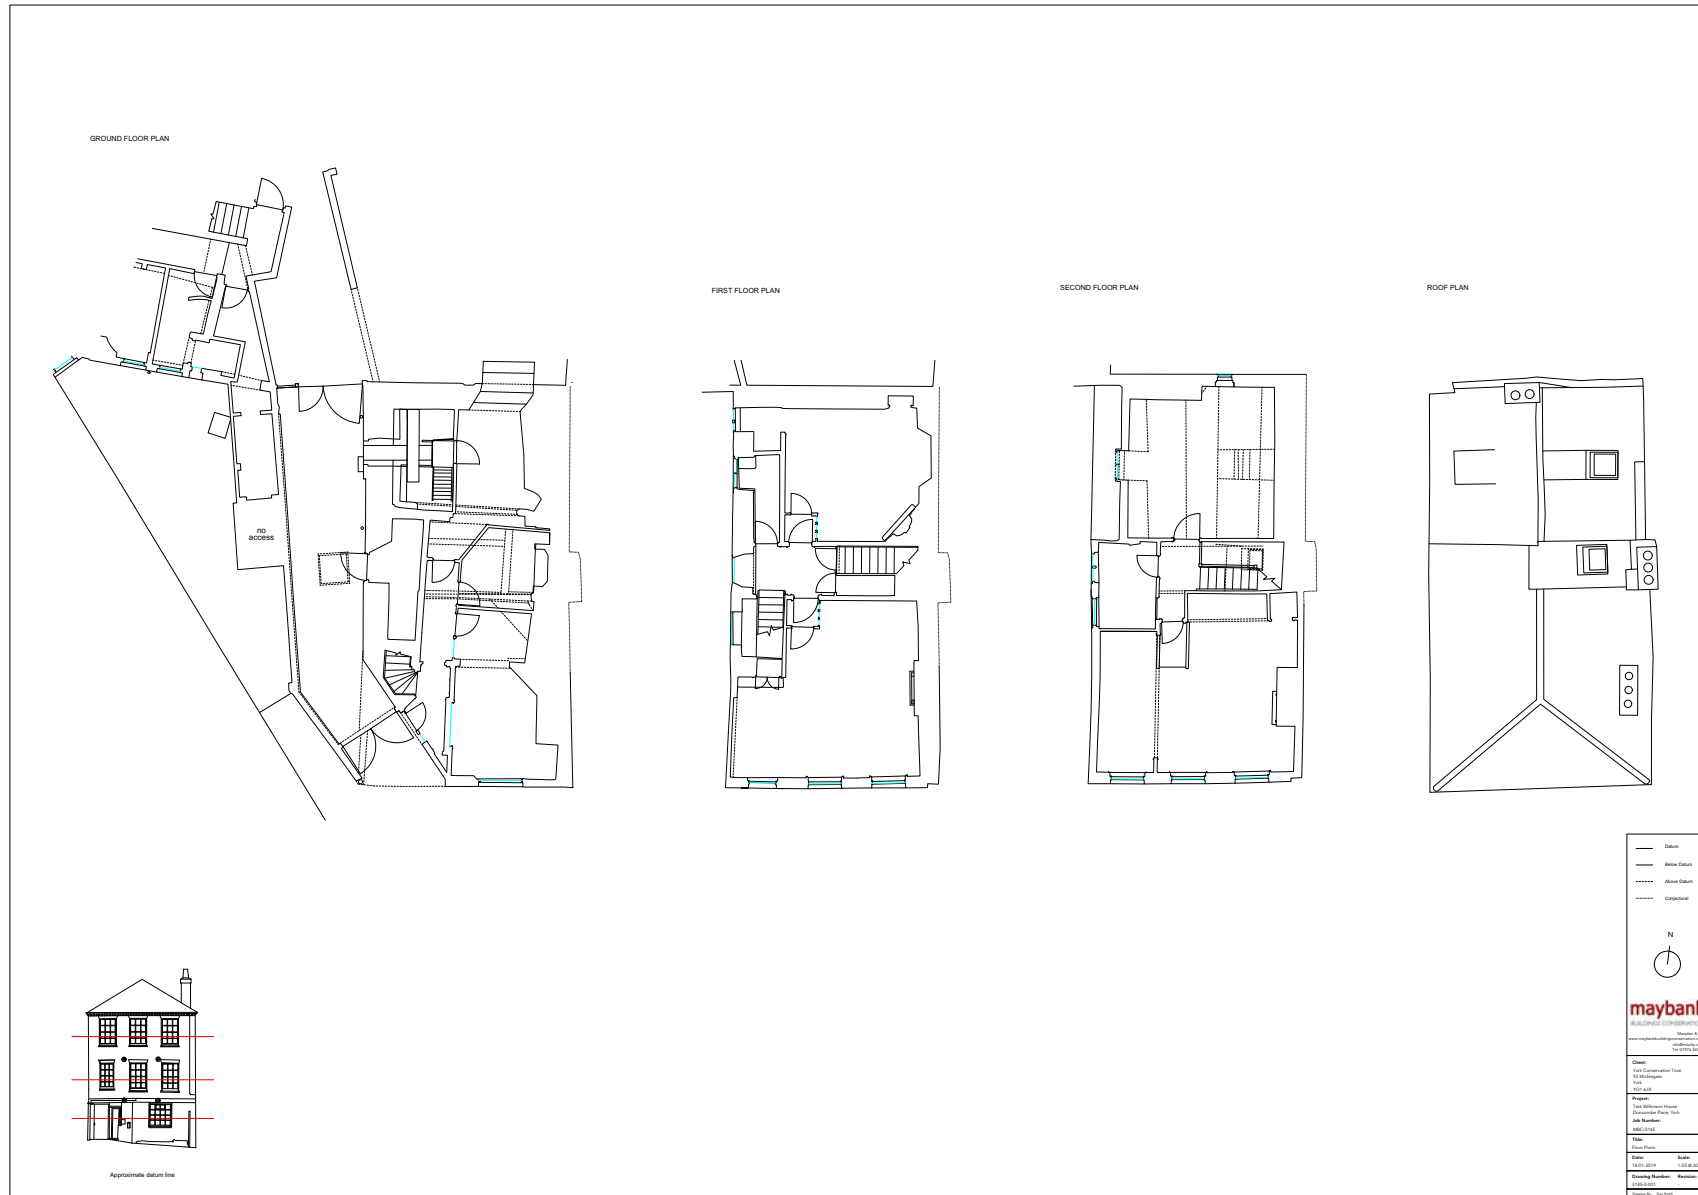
Metric plans of the TWH showing current layout of the building (Maybank Buildings Conservation 2019).
